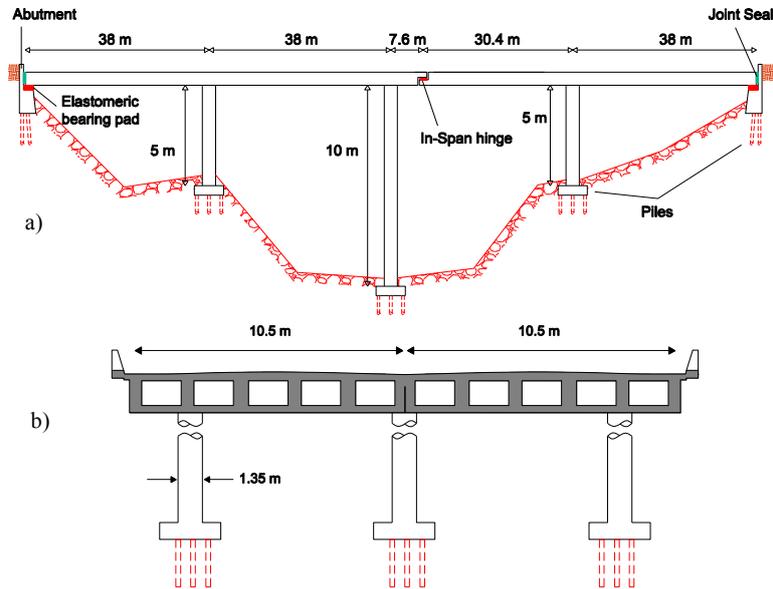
A general view of the multi-frame concrete box-girder bridge in: a) longitudinal direction, and b) cross-section.
